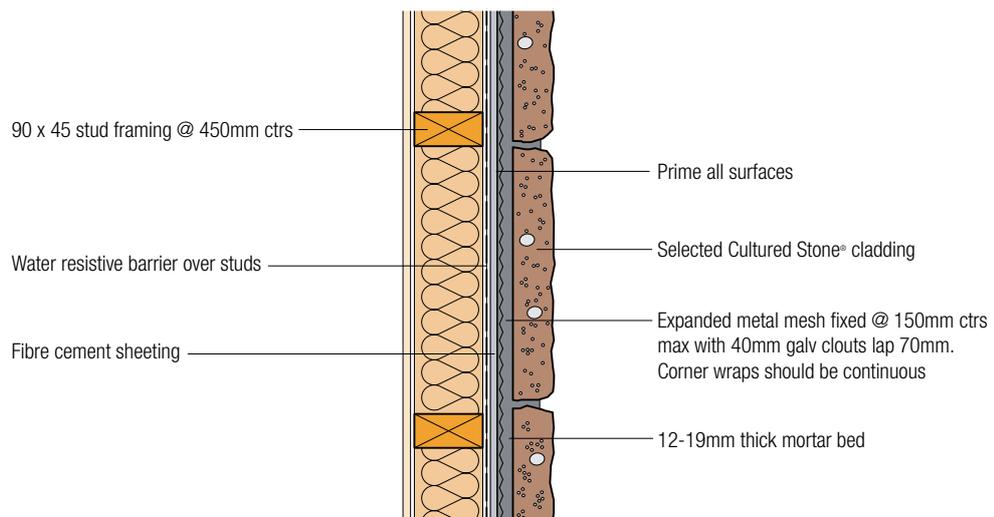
Fibre Cement Clad - Plan (Dwg # CS-03.01)
